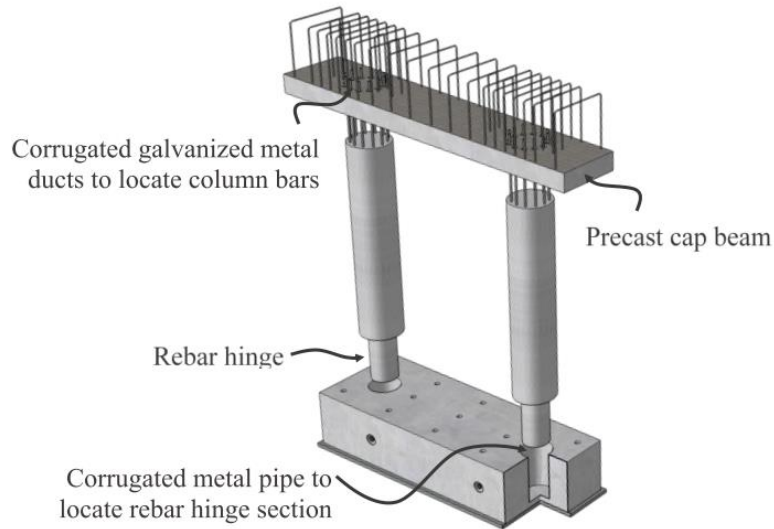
Schematic of ABC column connections (Shoushtari et al., 2019)
